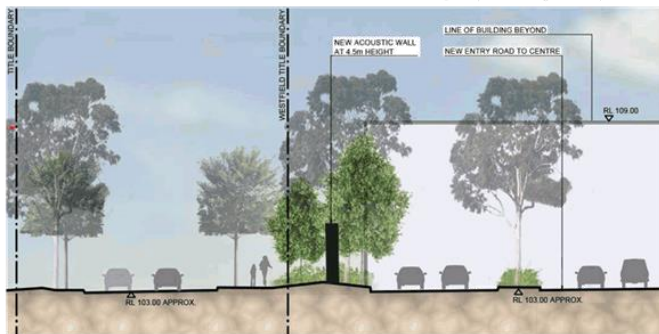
Proposed typical section through Westfield Drive showing typical landscape treatment and acoustic wall
